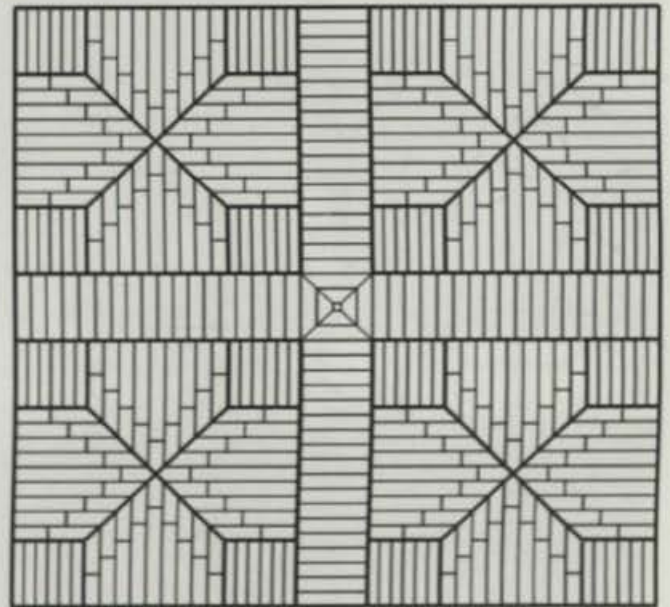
Wazir Khan Mosque, Lahore - cut and dressed flooring in geometrical pattern.
